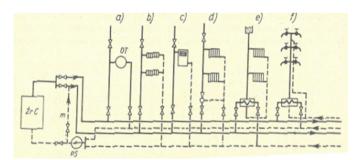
Four-pipeline network: a) direct connection of technological receivers, b) direct connection of central heating, c) direct connection of ventilation heaters, d) direct connection of central heating via hydro-elevator, e) indirect connection of central heating, f) indirect connection of hot tap water installation [12].]]
